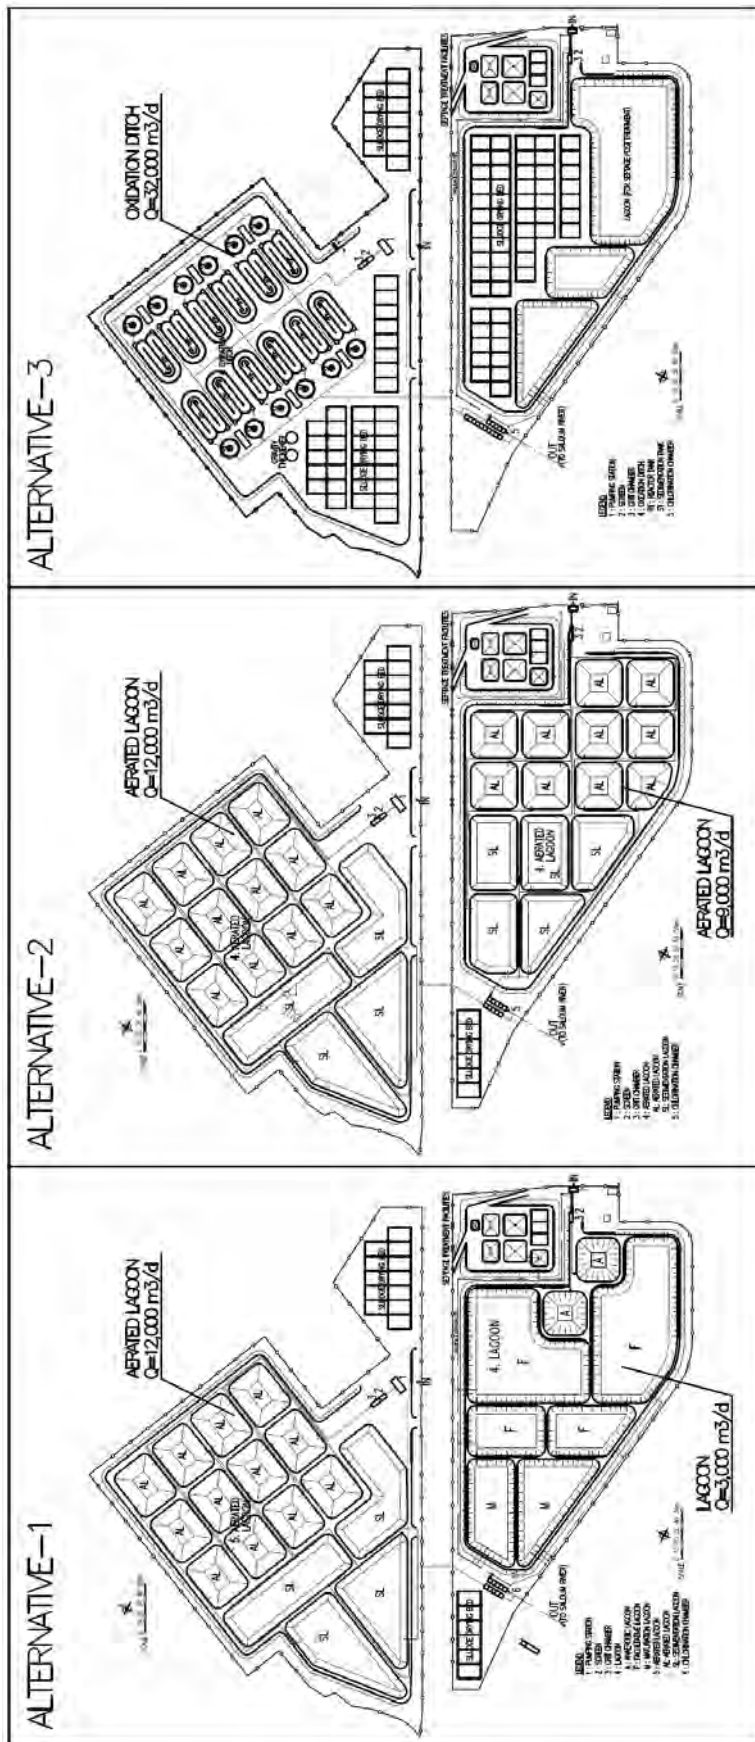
Layout Plan of Alternatives (STP)
